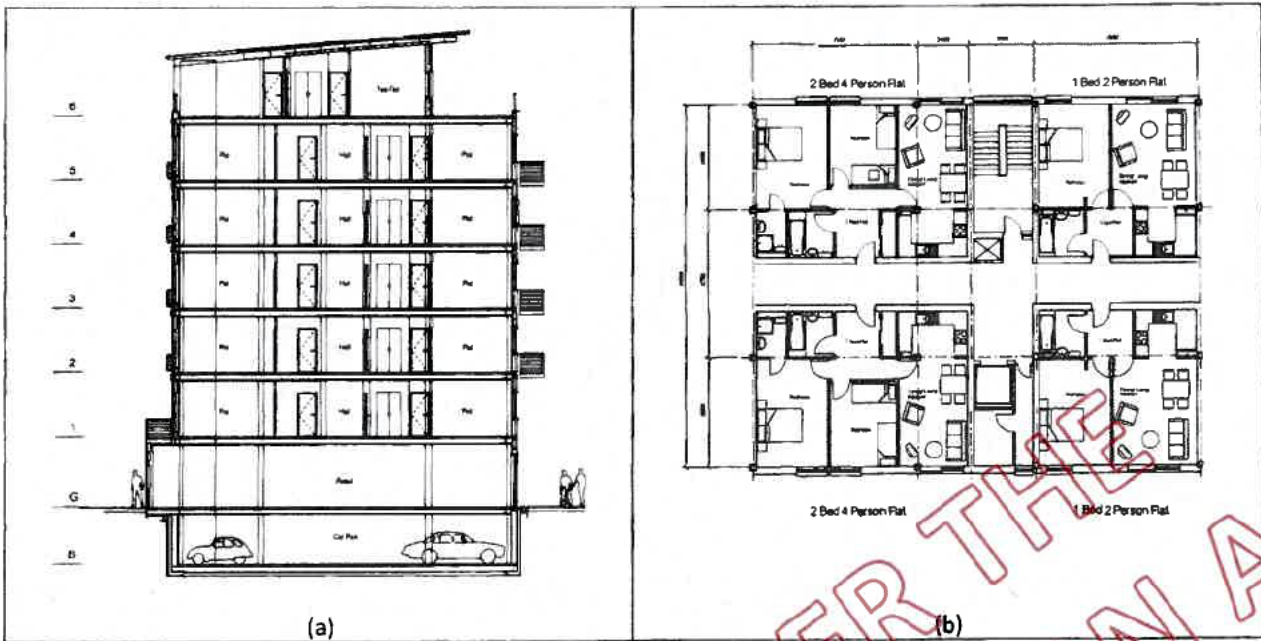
Exemplar 6 storey mixed-use residential building (a) cross-section through building (b) repeatable floor plan area
